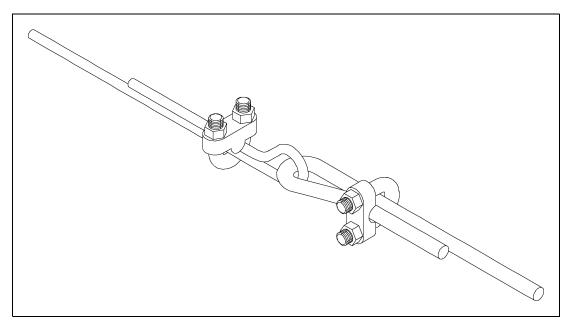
N Cable-to-Cable or Cable-to-Rod Connections
